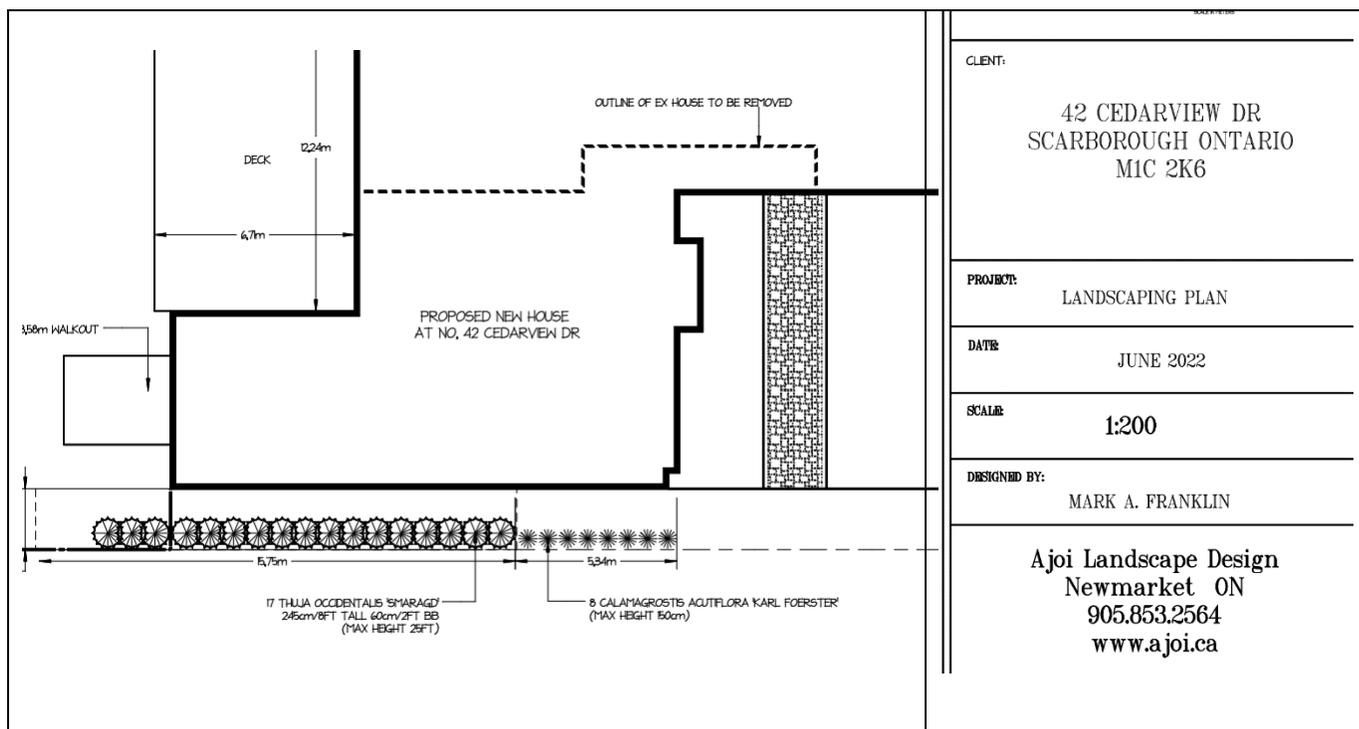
Left: Thuja plantings to mitigate privacy; Right: title block of landscaping plan
